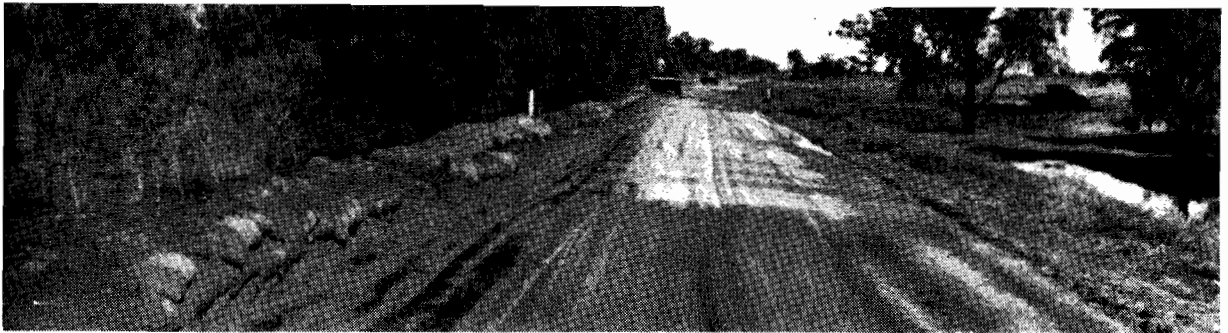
Levee banks holding back flood water from the Murray River at 33 miles.
